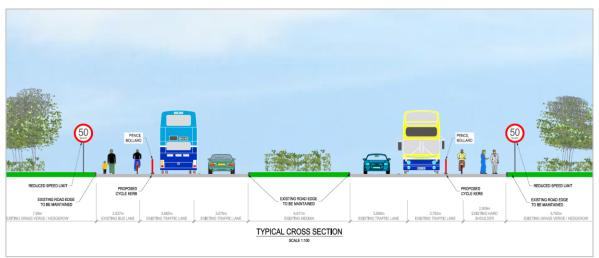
Typical Road Cross Section Detail Between Junctions
